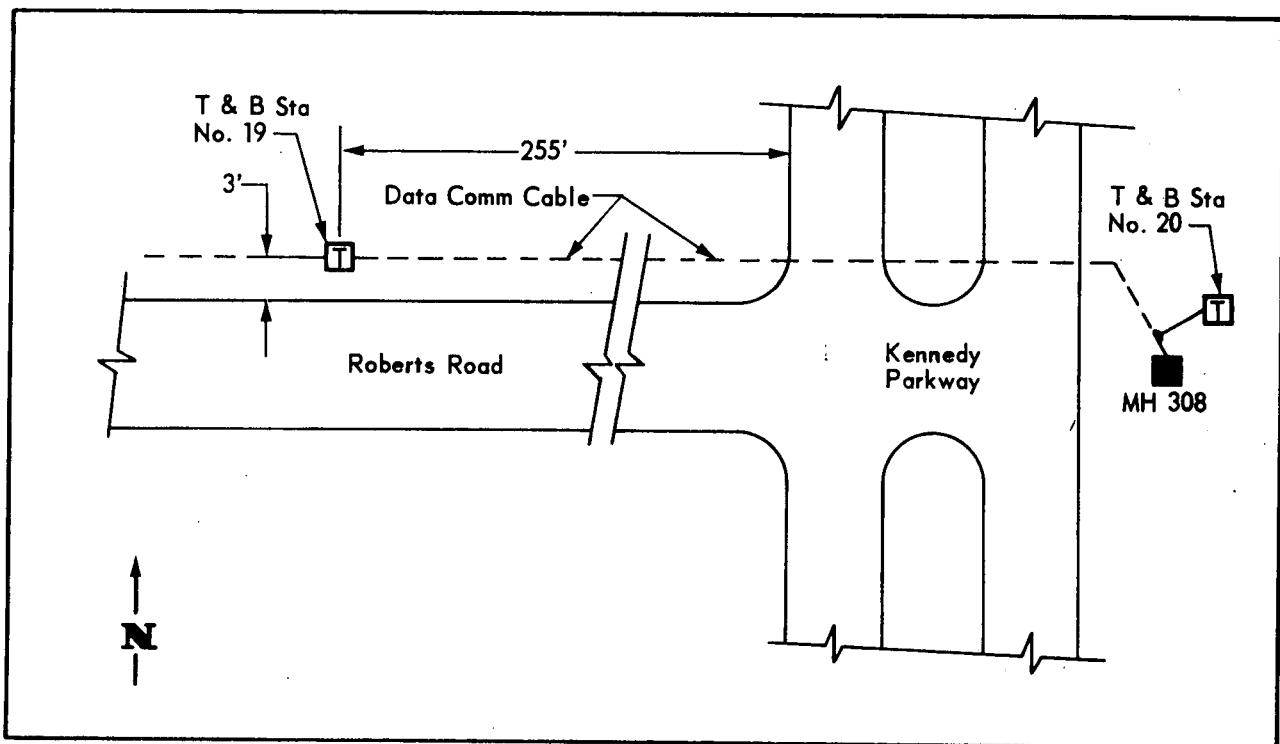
Test and Bond Stations No. 19 and 20 Equipment Locator
